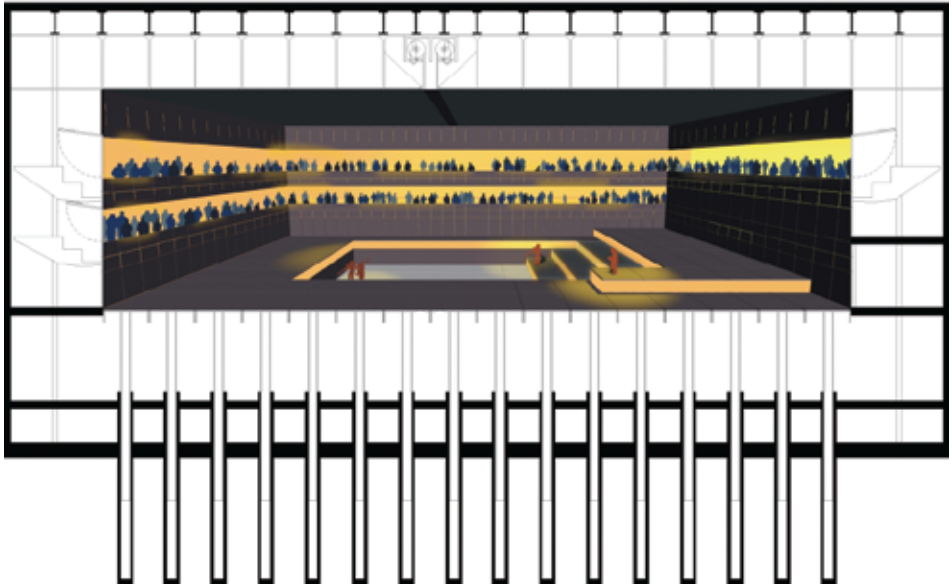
Illustration No. 7: Interior view with “anchoring” below (©GKK Architects).
